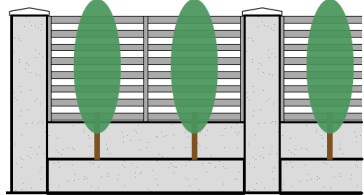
Semi-permeable fencing – rendered masonry pier with low wall, integrated planter and permeable infill panels above
